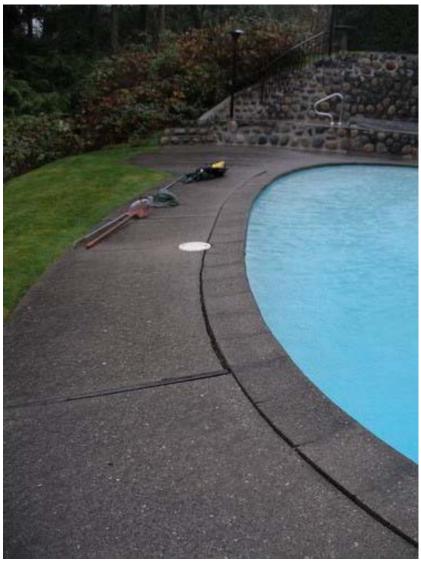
1425 Lennox Street – Settlement of concrete panels around swimming pool
